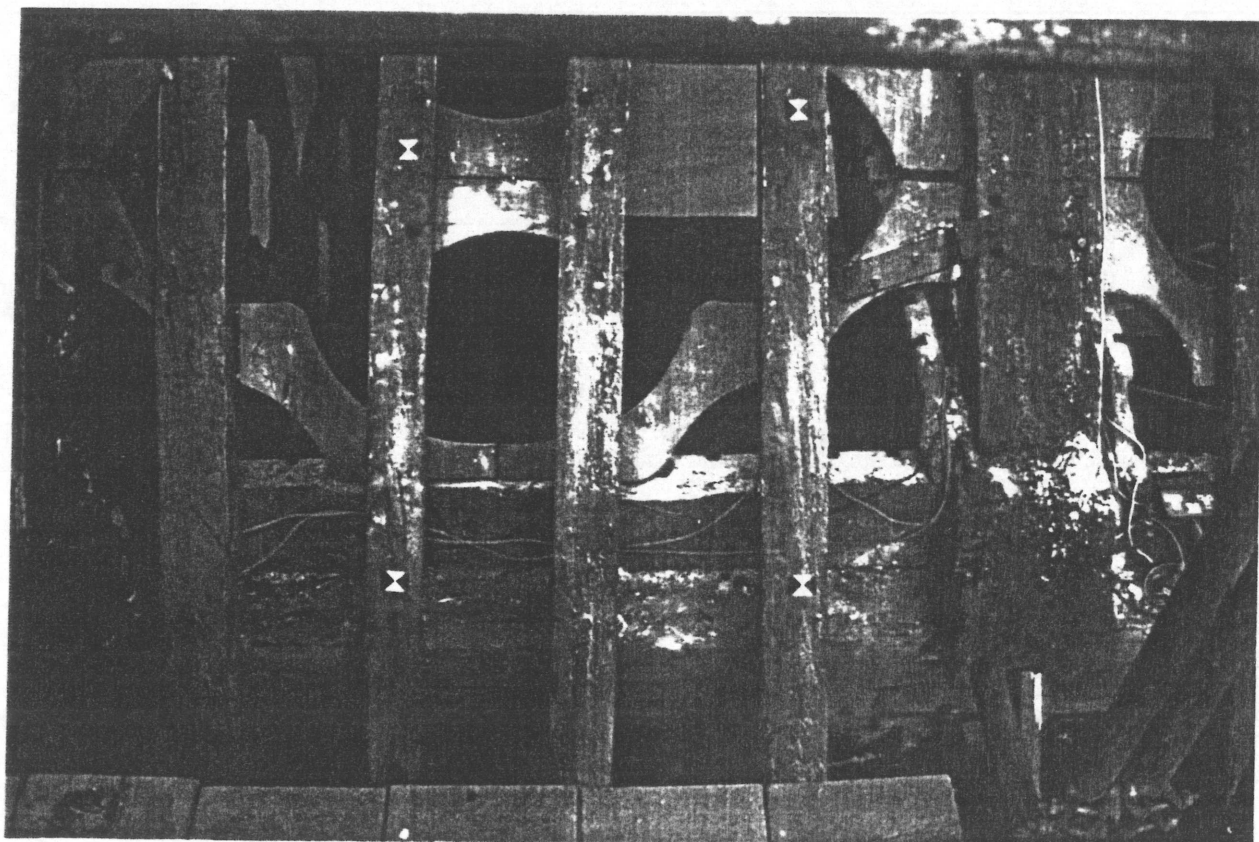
Roof detail on north side of roof pitch showing wall plate and hammer beam
